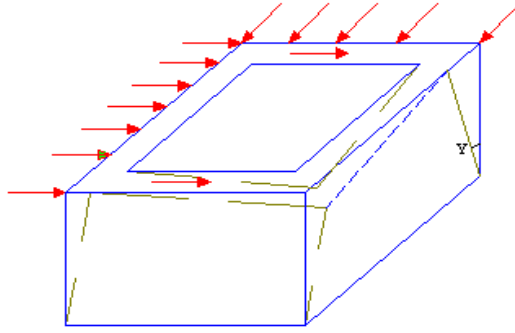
Building corners under horizontal forces (Çöğürçü, M.T.)
